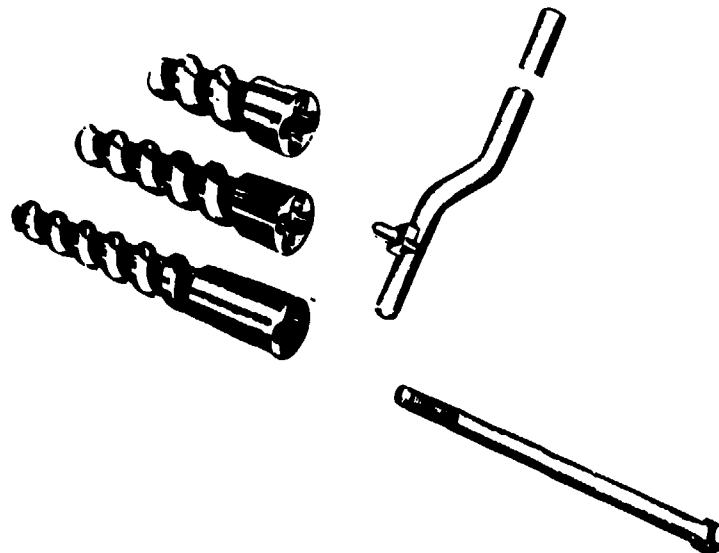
Screw anchorage (Reprinted from "Precast Concrete Production" by J. G. Richardson)
